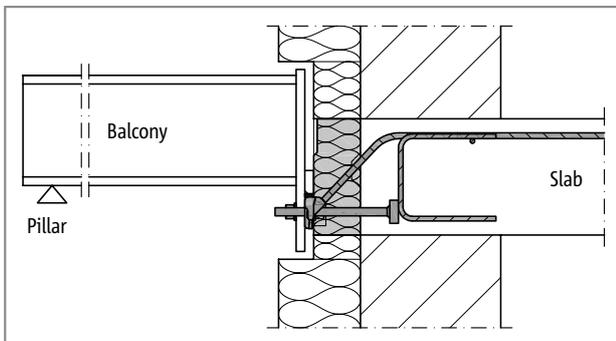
Isokorb® T type SQ: Barrier-free access due to height offset
